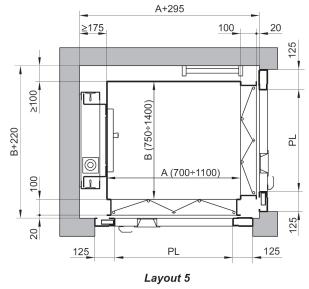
Minimum shaft dimensions with "bus" type folding car doors
